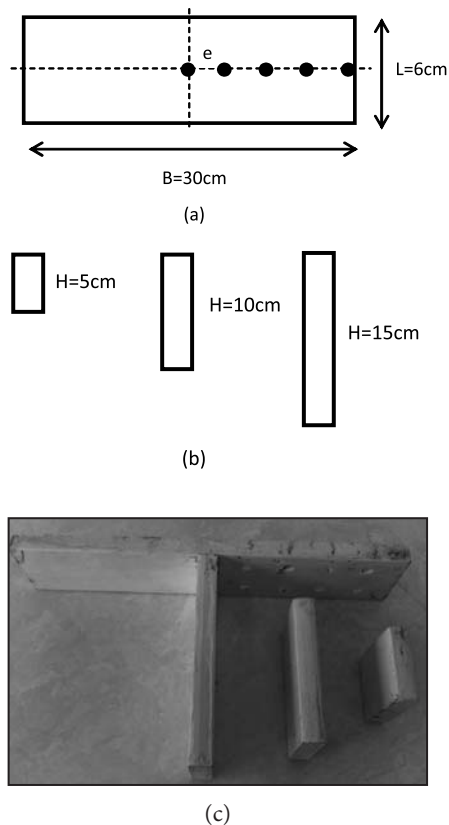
Strip footings: (a) plan view; (b) elevation; (c) photograph.
